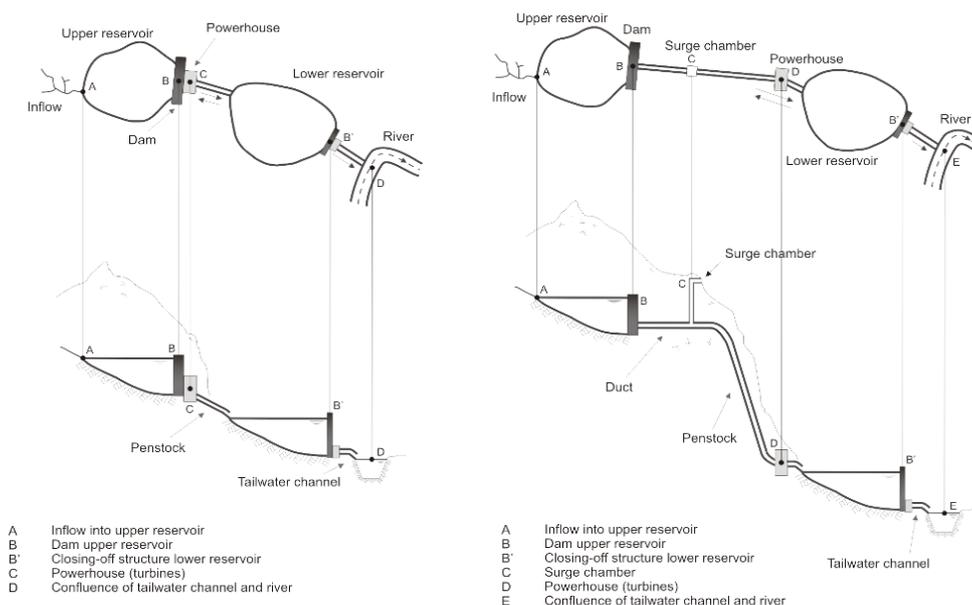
Schematic overview of a pumped-storage hydropower plant: barrage power plant (left) and diversion plant (right) (after Habersack et al., 2011)
